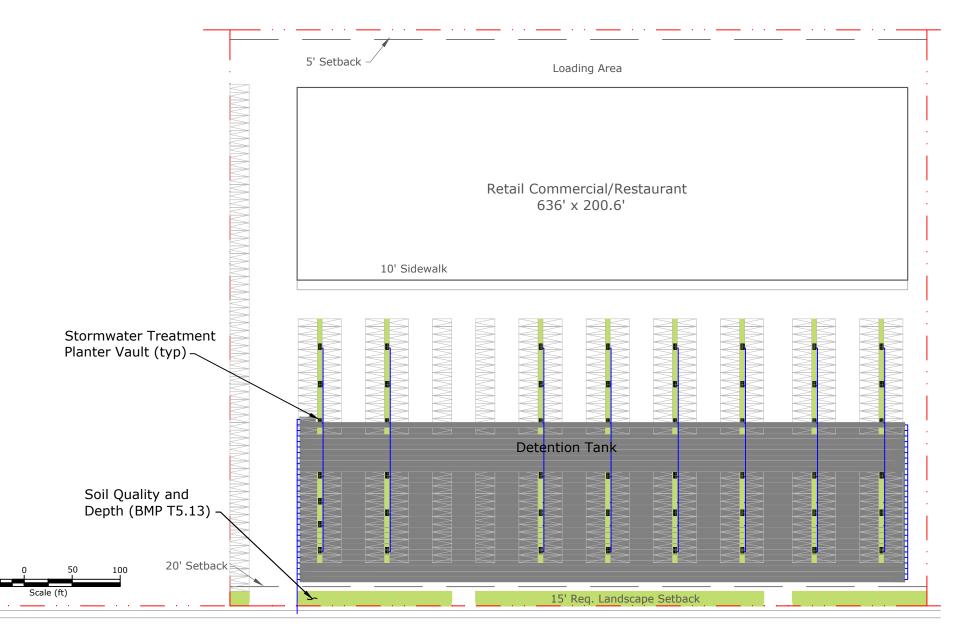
Scenario 12. Permanent Stormwater Site Plan – Large Commercial Development, 2005 Requirements, Till Soils
